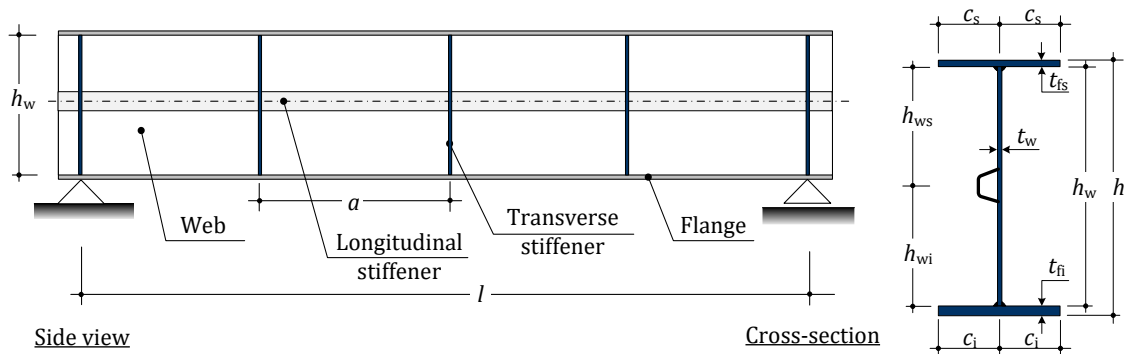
Plate girder – geometry and notation [adapted from ref. 15]
